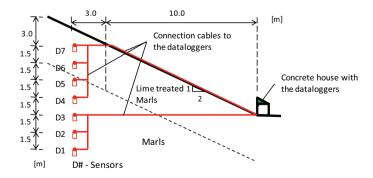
Profile instrumented with sensors ECH<sub>2</sub>O
